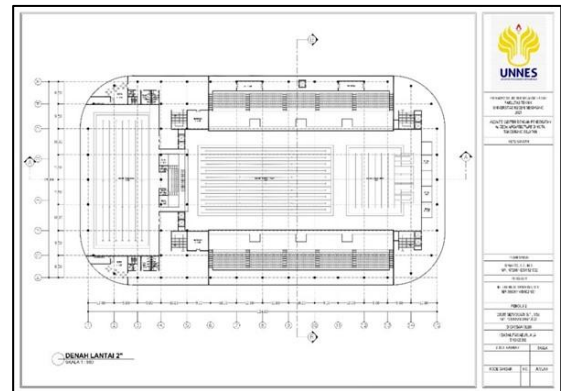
2<sup>nd</sup> Floor Plan Main Building
